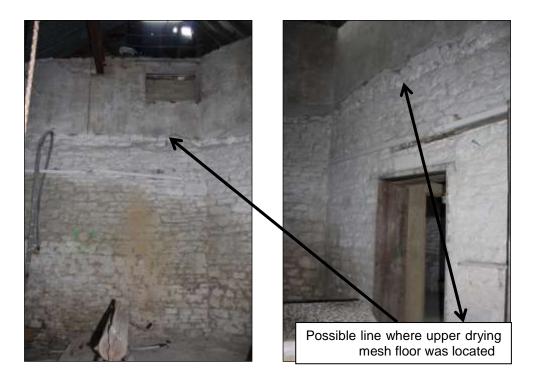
Two views of scar lines showing where the drying floor in the kiln was located
